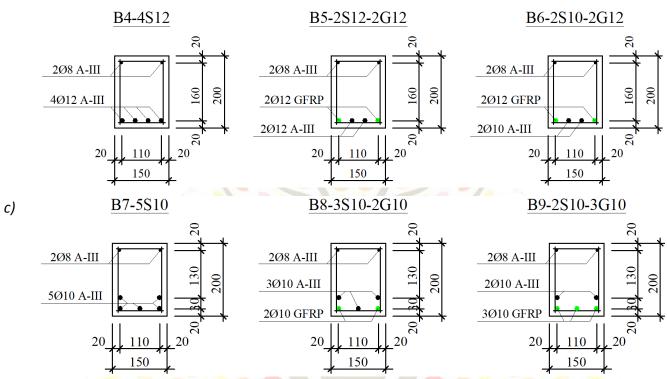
Cross-sections of experimental beams and layout of reinforcement cages
